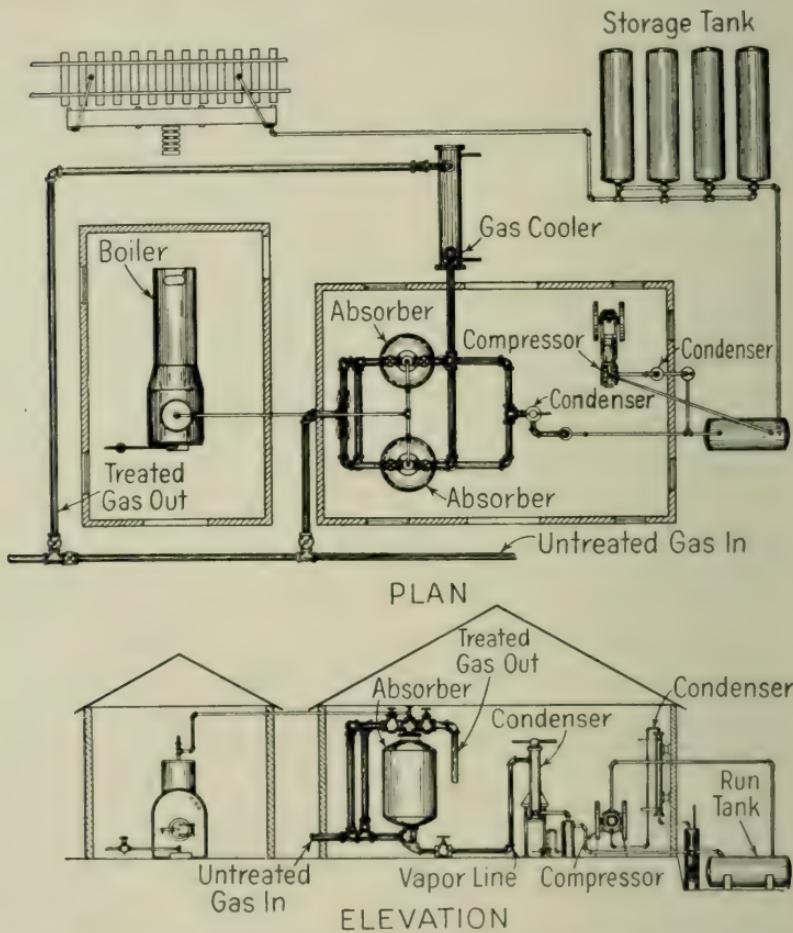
PLAN AND ELEVATION OF GASOLINE EXTRACTION PLANT
